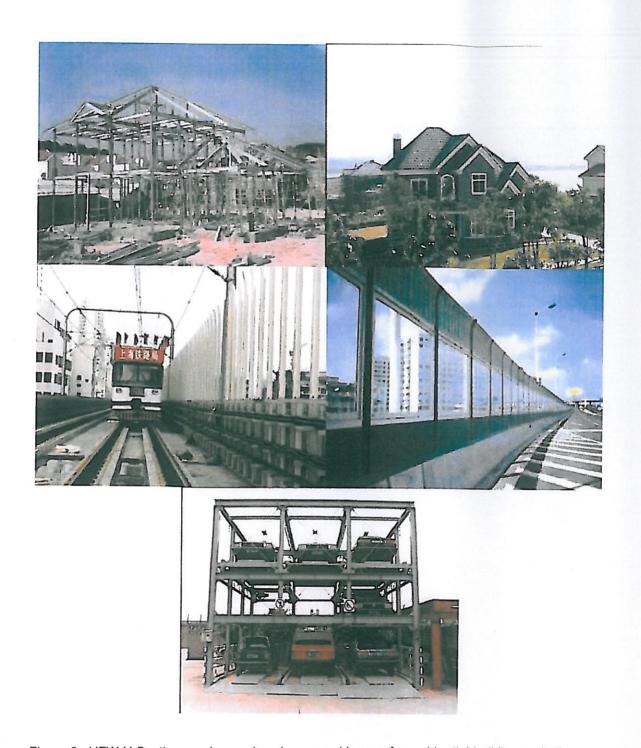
HFW H Section used as main columns and beams for residential building and other application
